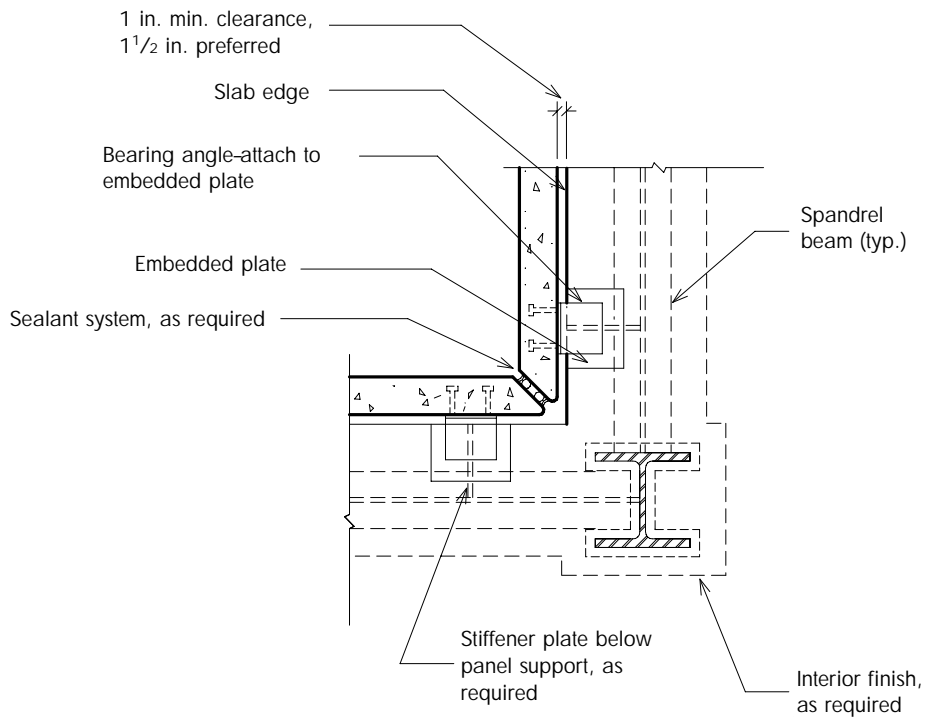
Detailing Considerations for Precast Concrete Panels (Sample Wall Section Detail at Horizontal Span Precast Panels)
